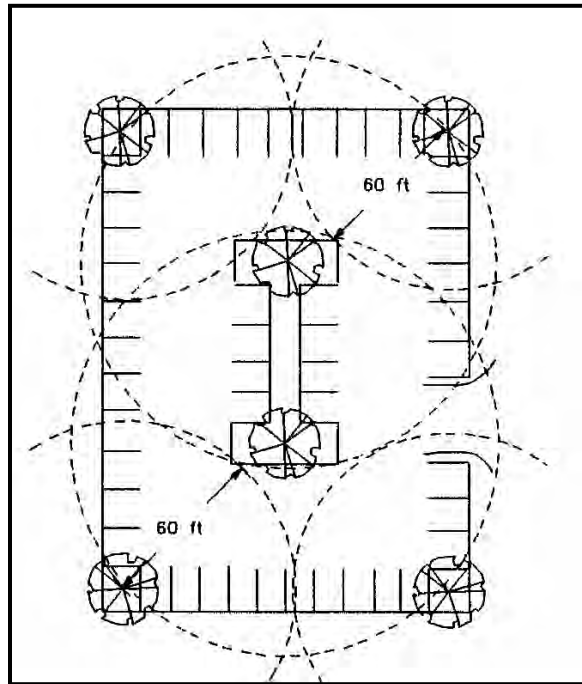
EXAMPLE LANDSCAPING AREA FOR LARGE PARKING LOTS
